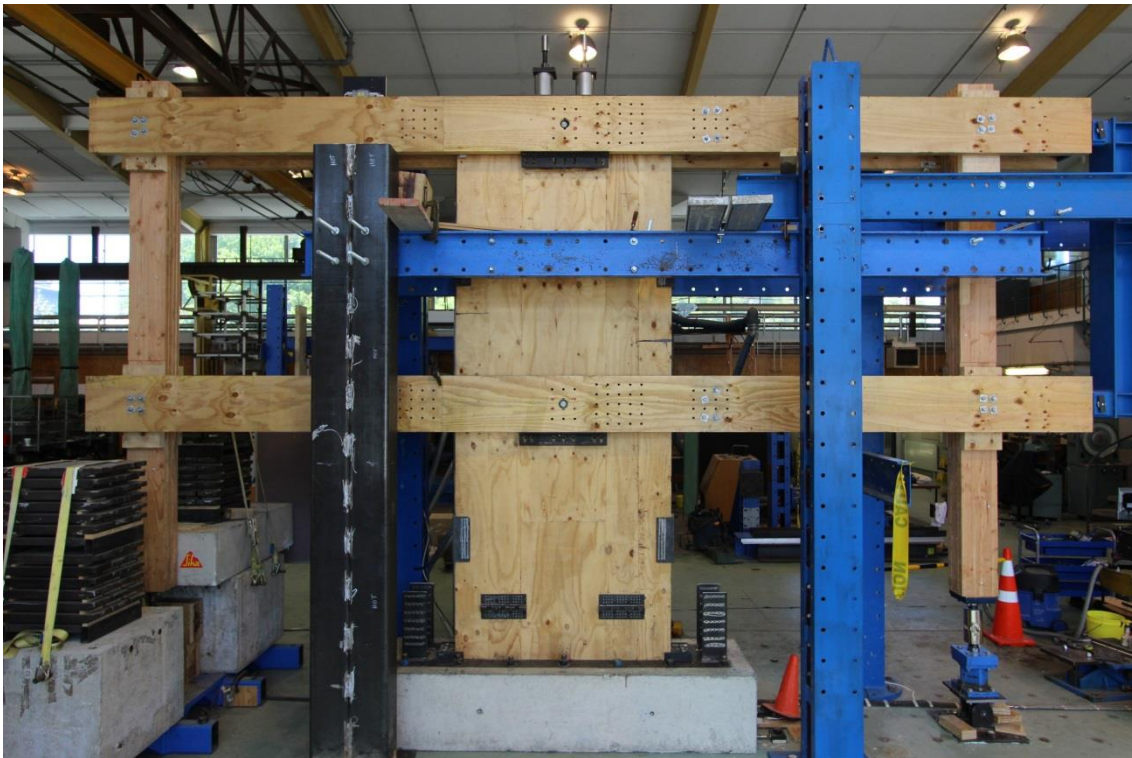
Experimental setup of a post-tensioned rocking wall with collector beams
